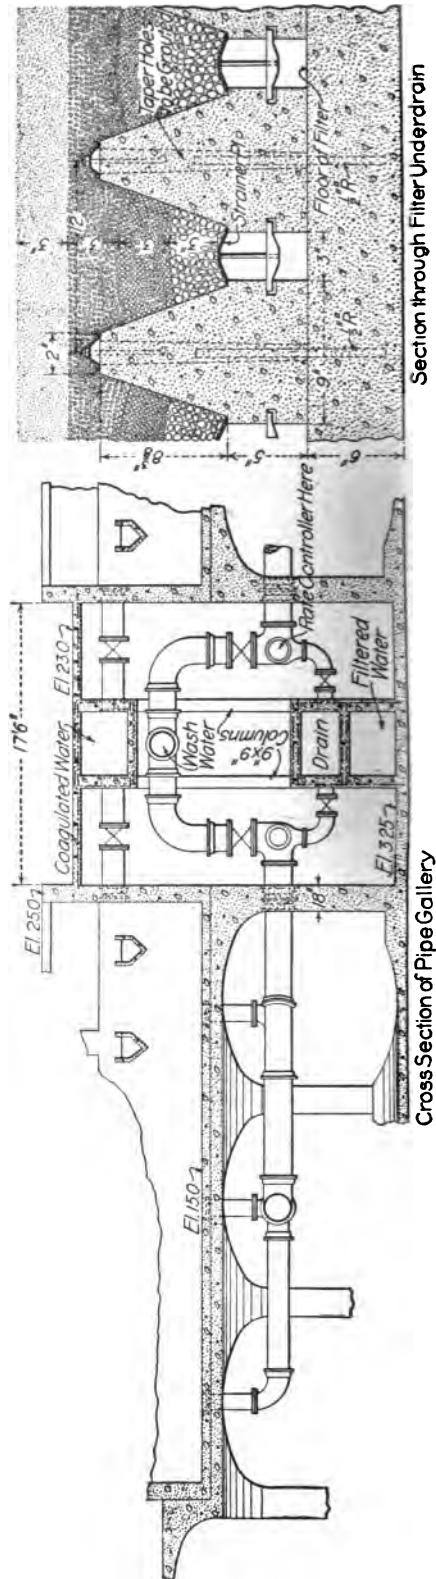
Cross Section of Reservoir, Pipe Gallery and Underdrains, Evanston Filter Plant.
